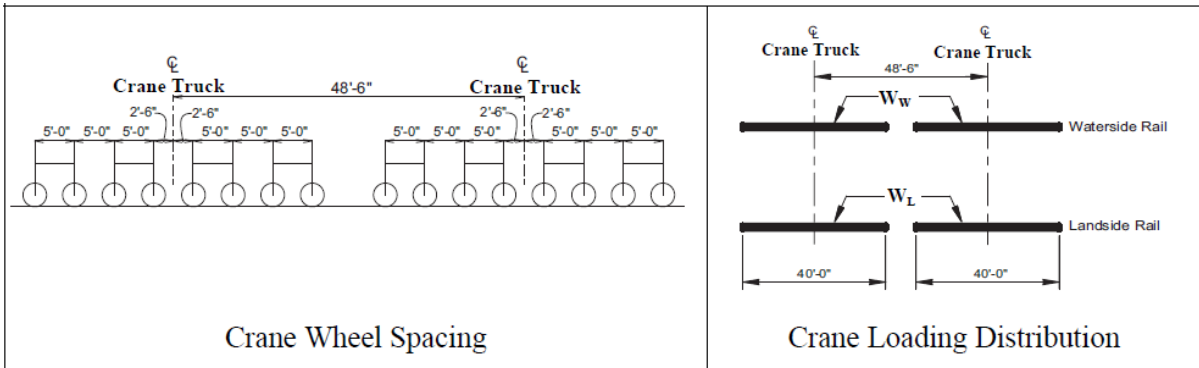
Crane Wheel Spacing and Load Distribution for 100-ft-gage Container Crane
